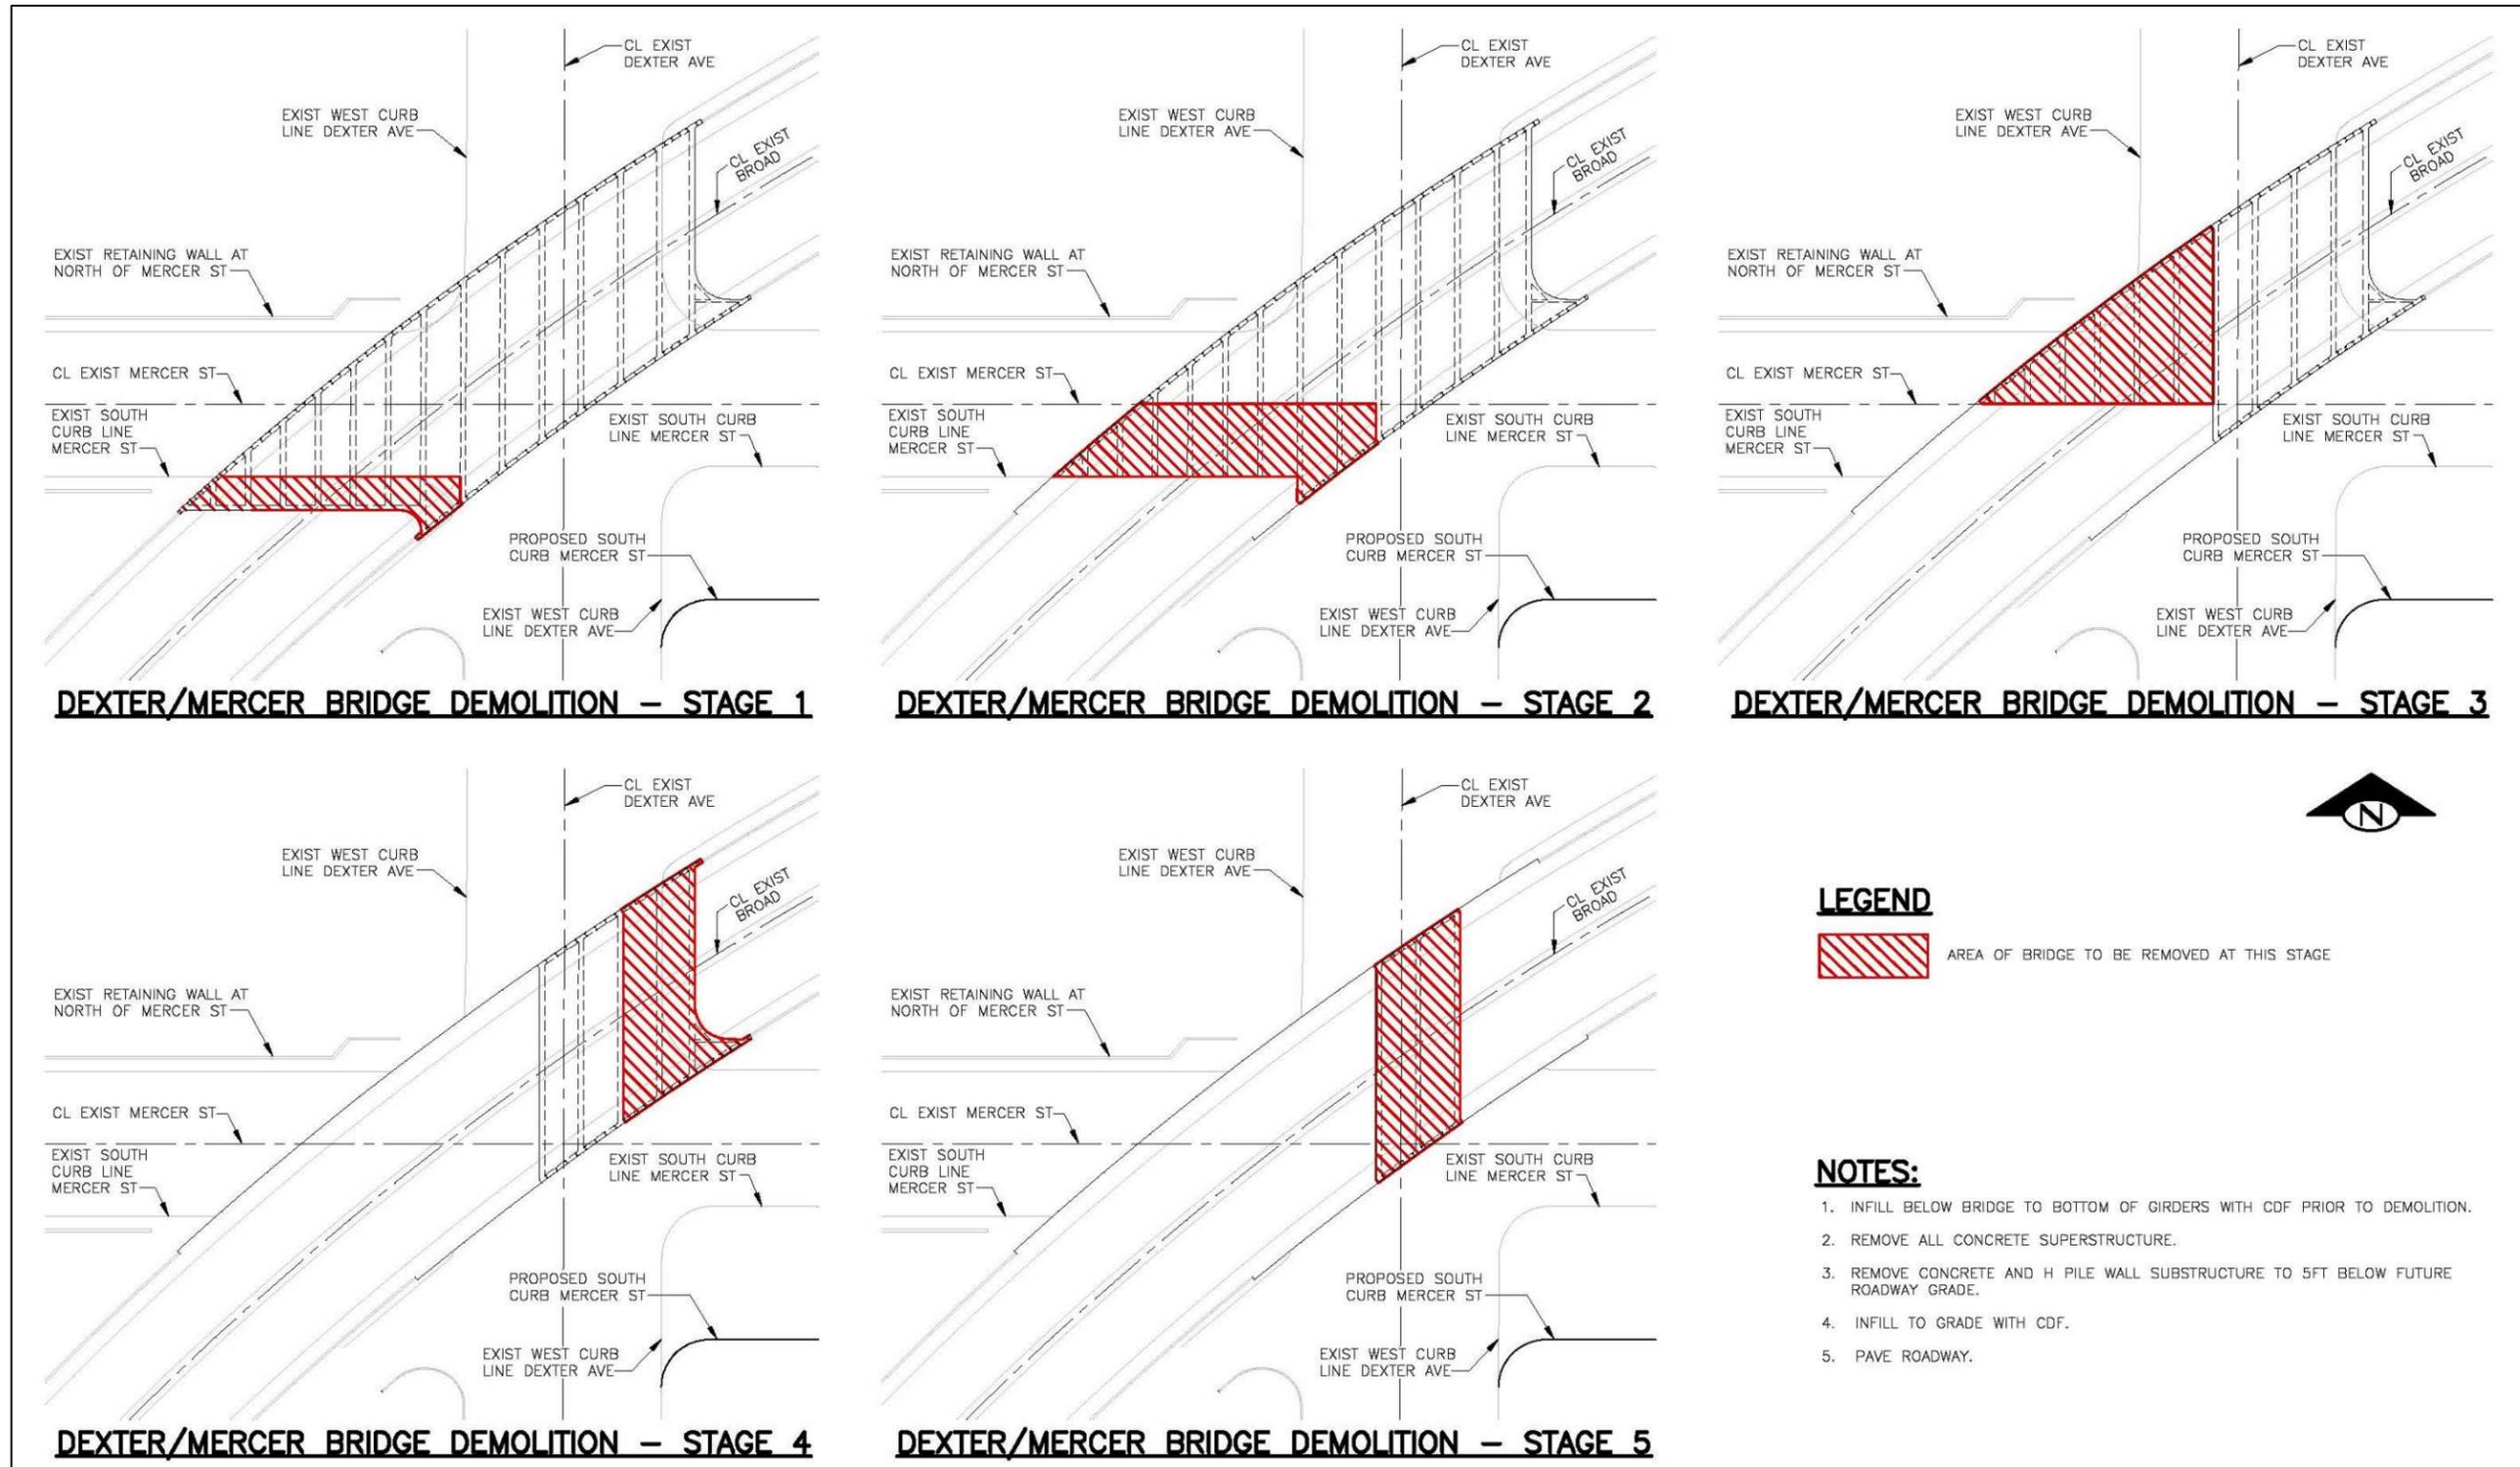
Demolition sequencing for the bridge at the intersection of Mercer Street and Dexter Avenue North over Broad Street
